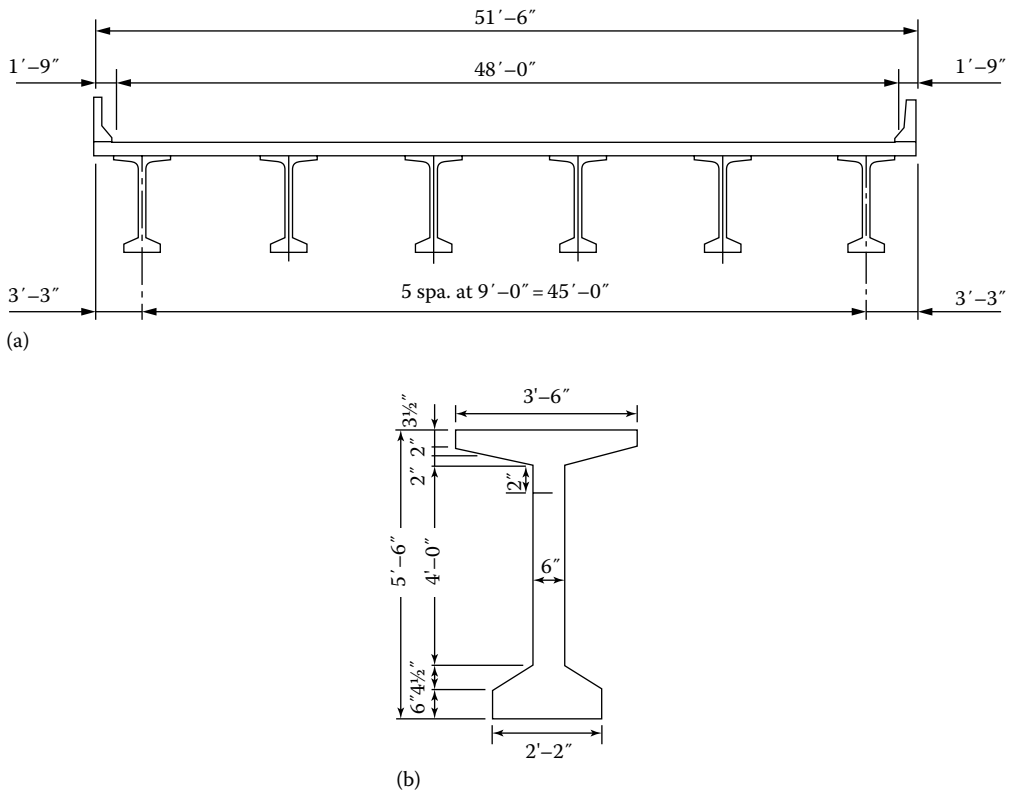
Cross section of proposed slab–prestressed concrete girder bridge. (a) Bridge cross section and (b) cross section of BT-72 precast prestressed concrete girder.
